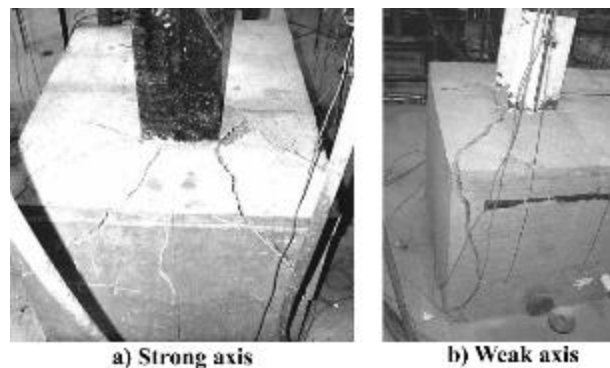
Observed failure in test specimens with existing connection details (Shama, Mander, & Aref, 2002)
